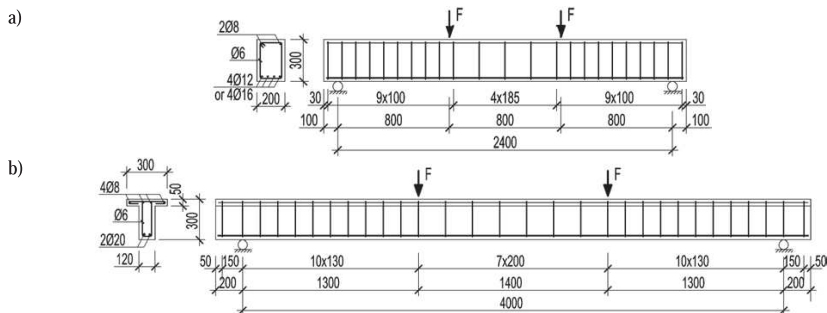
Dimensions, reinforcement and loading scheme of tested elements with: a) rectangular cross-section, b) T-shape cross-section
